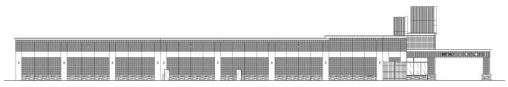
Home Depot Williams Parkway (North) Elevation
